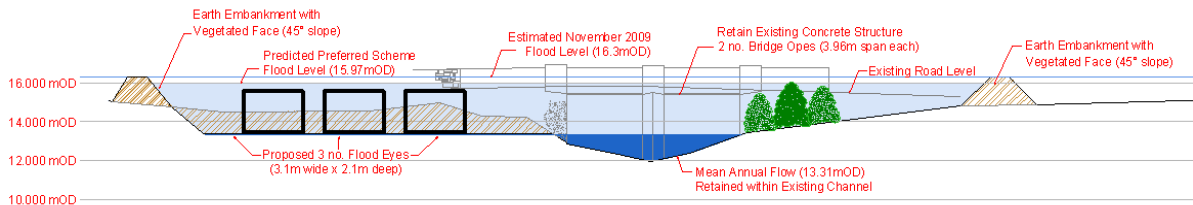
Proposed Works at the Dunkellin Bridge
